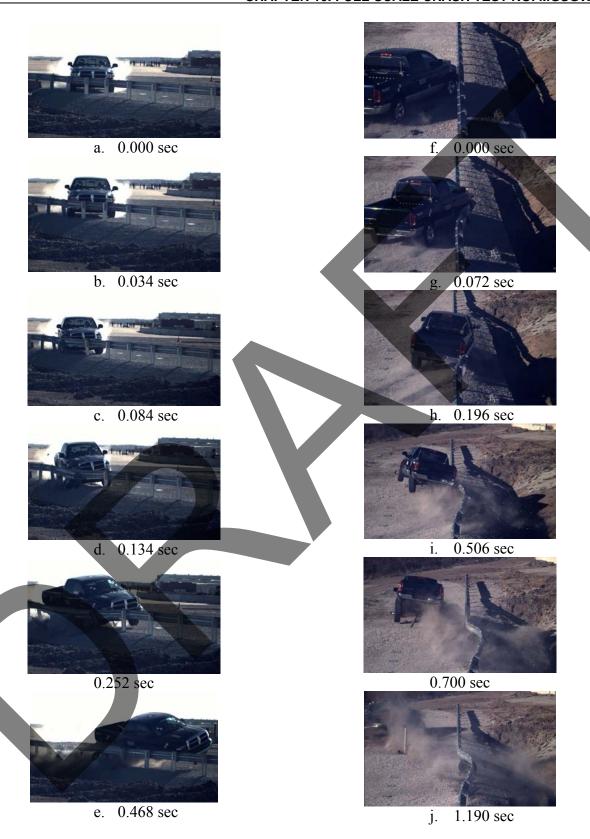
Photo. Additional Sequential Photographs, Test No. MGSGW-2.
